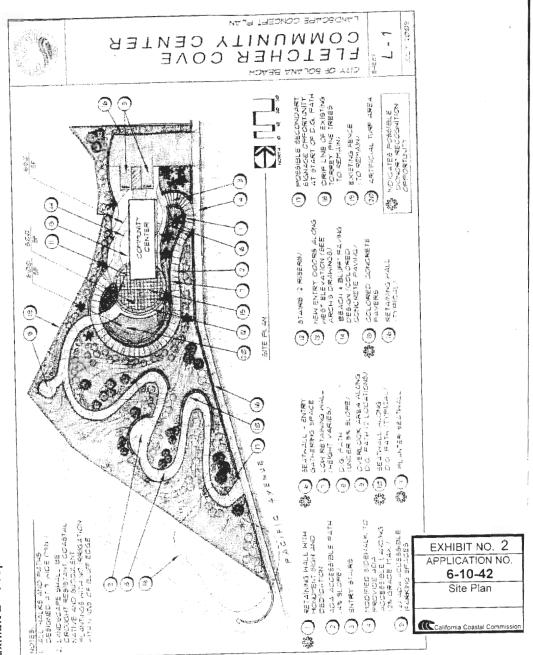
Proposed Site Plan and Landscape Concept Plan
